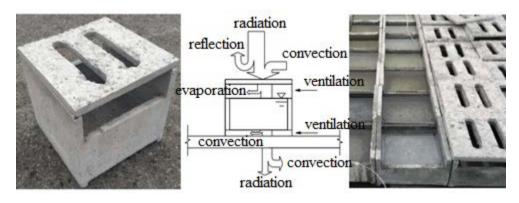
The Water-Retaining Roof Bricks (Han et al., 2017).
